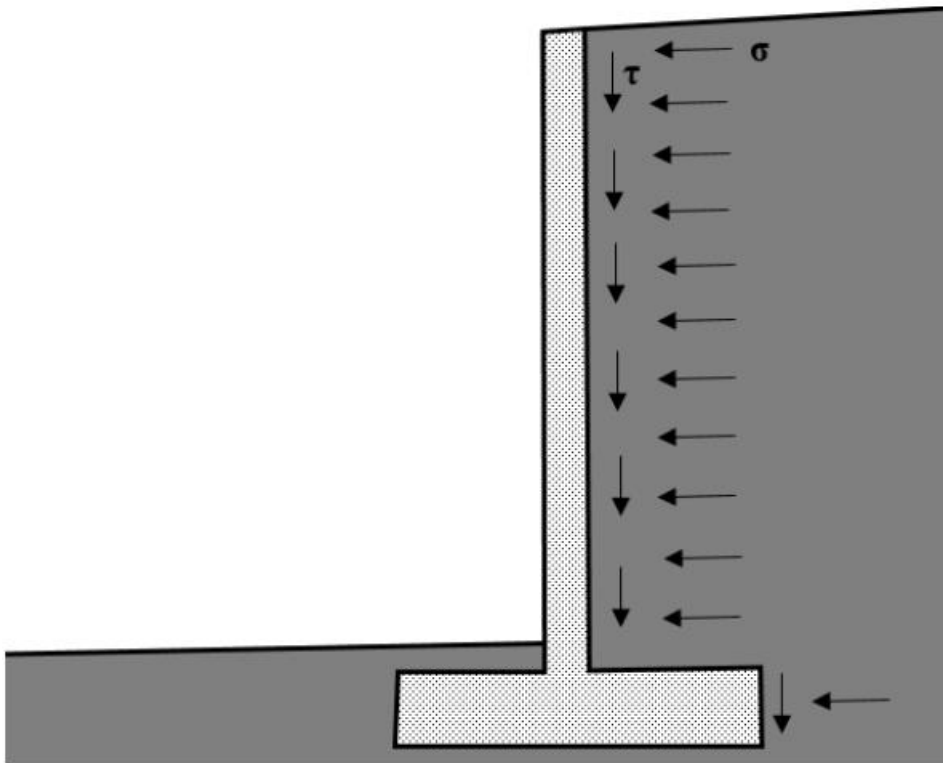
Retaining wall with lateral earth pressure shown (Coduto et al., 2011)
